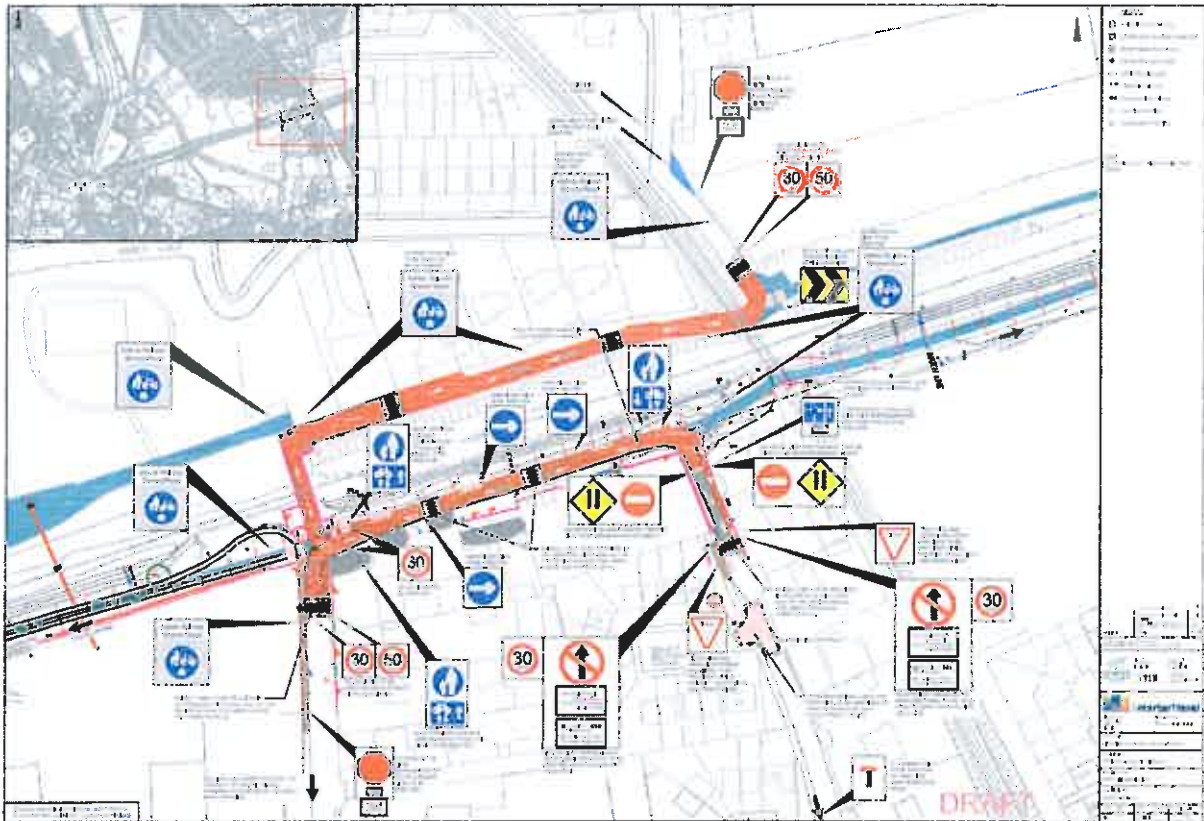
Proposed Signal Layout (ARUP Consulting Engineers)
